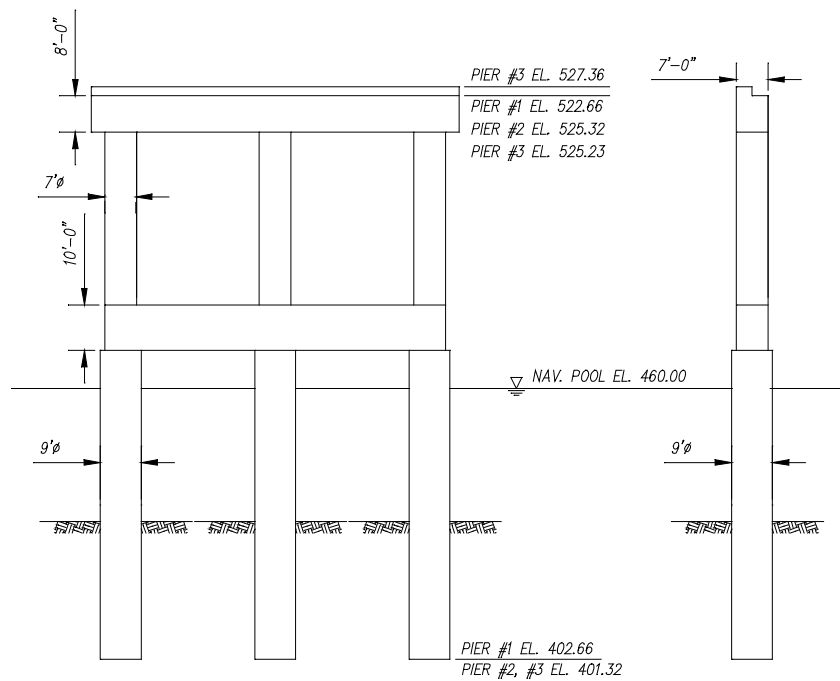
Pier 3 Shown, Piers 1 & 2 Similar
